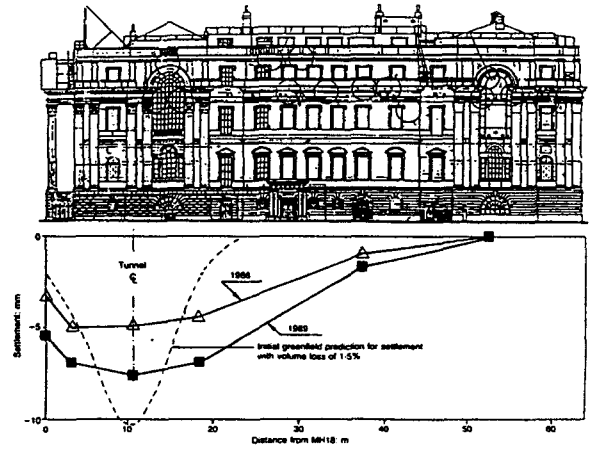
Settlement of west wall of Mansion House on 16 July 1963 and 7 June 1969
